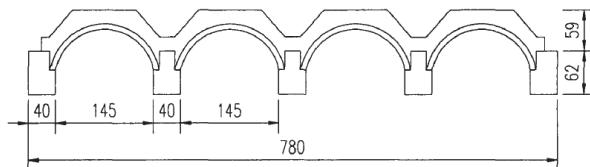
Transverse section of Shuiwen Bridge (dimensions in cm)
